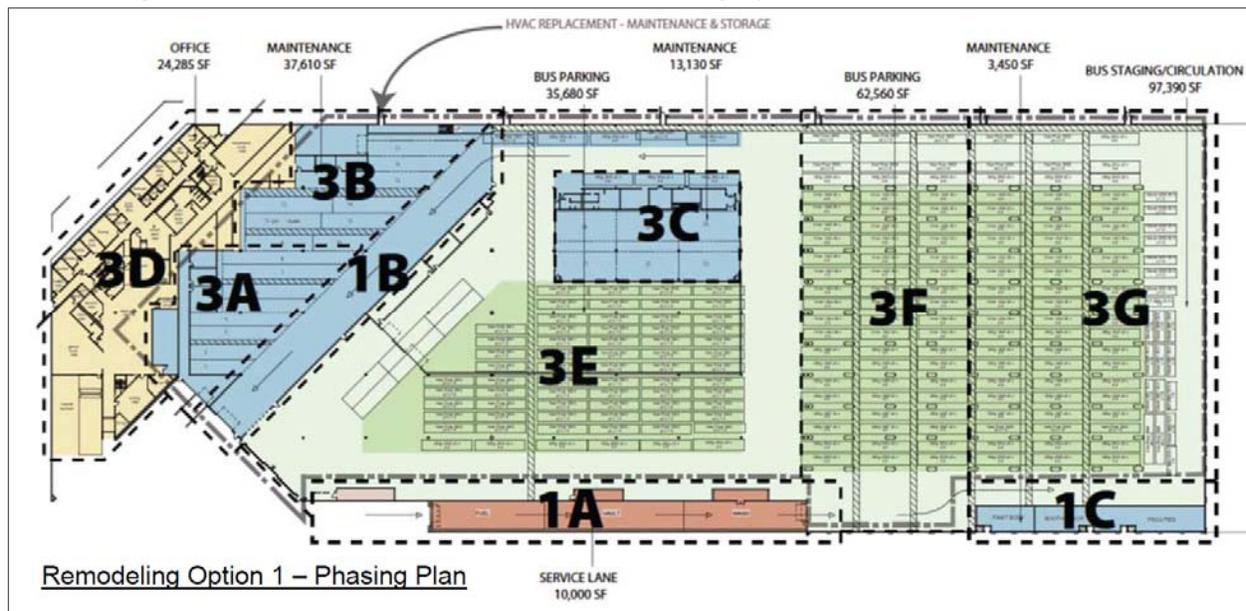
1101 East Washington Ave Phasing Plan
